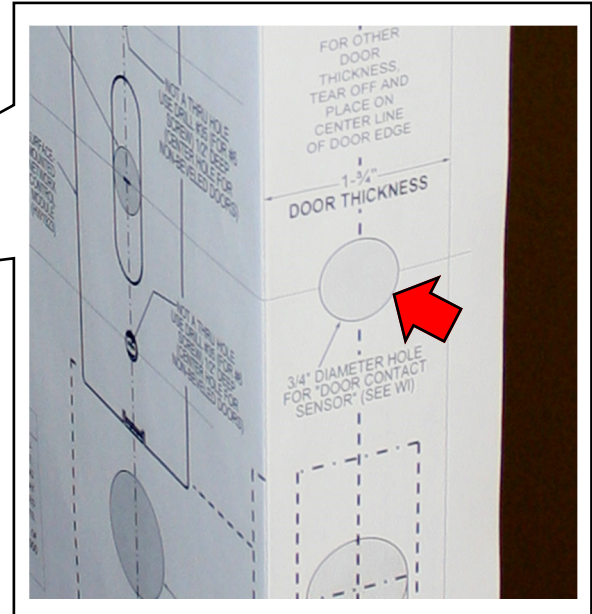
A: HOLE LOCATION DEPENDS ON DOOR THICKNESS
